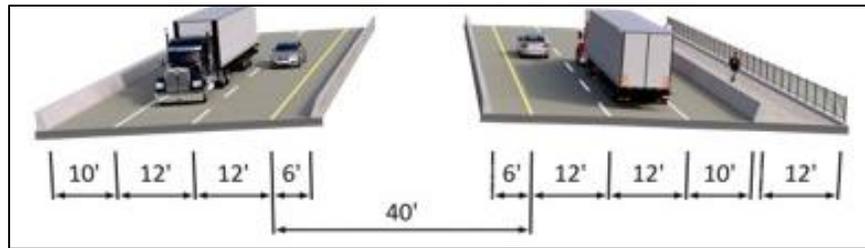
| Preferred Alternative Bridge Typical Section – S. R. 70 over Indian Prairie Canal C-40
